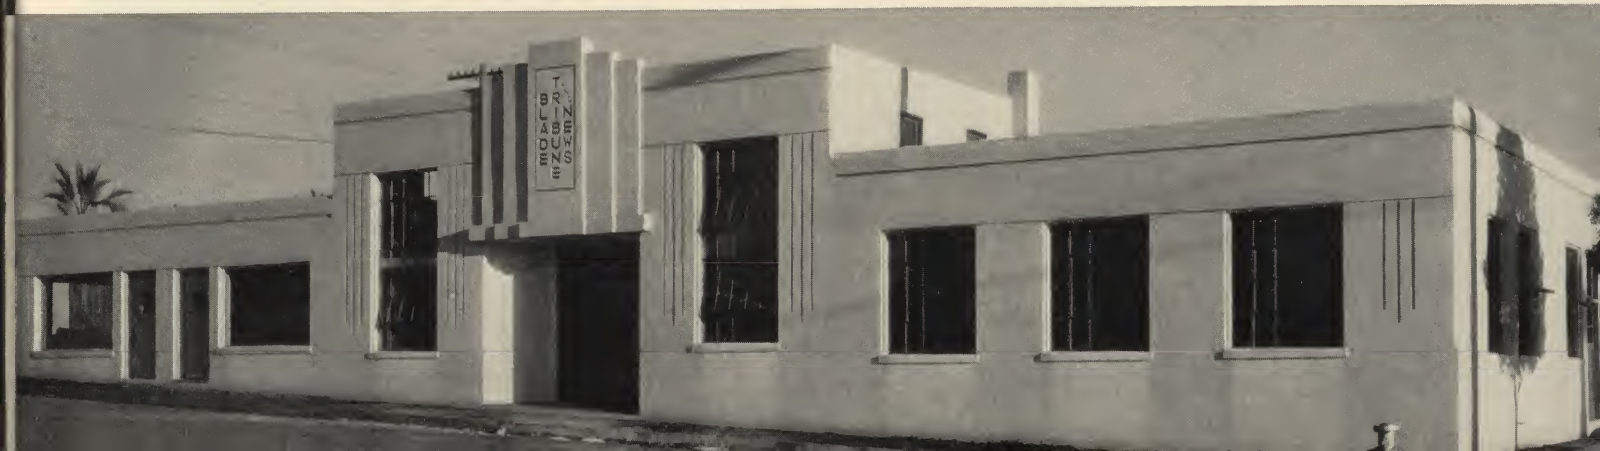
Variety of textures lends interest to Shopping News building, Long Beach, Calif., designed by Miller and Gibbs, architects, and built by J. E. Burrell, contractor. Plywood with smooth joints was used for the spandrel forms, while slight irregularity of the joints between plywood panels on the parapet were permitted to produce interesting contrast. An even greater contrast is obtained by using rough-sawed sheathing with chamfered edges for the wall between spandrel and parapet. Construction joints at sill and head of windows are obscured by the projecting bands.
